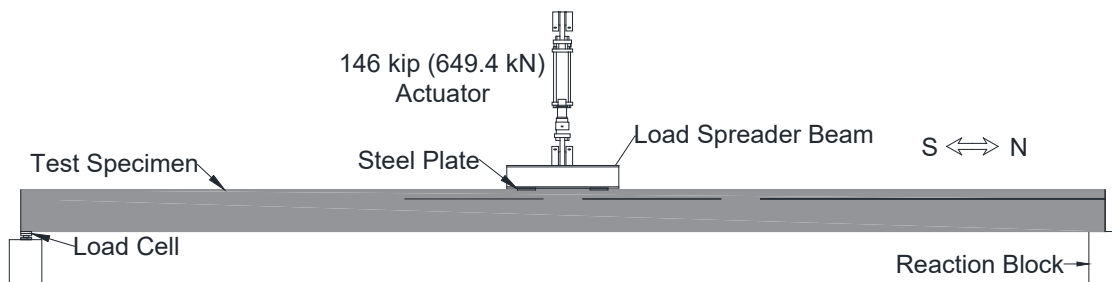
Strength Test Setup for Salvaged Girders – Elevation View without Test Frame
